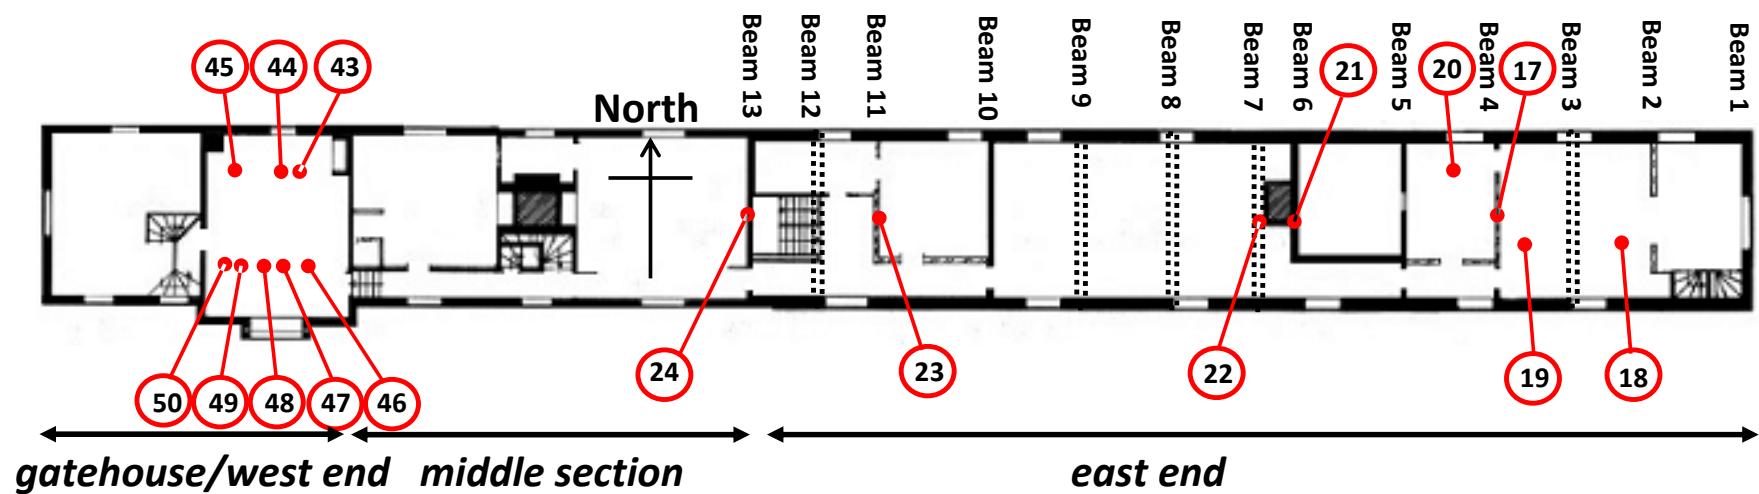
Simple plan of the hall range at first-floor level to help locate sampled timbers
